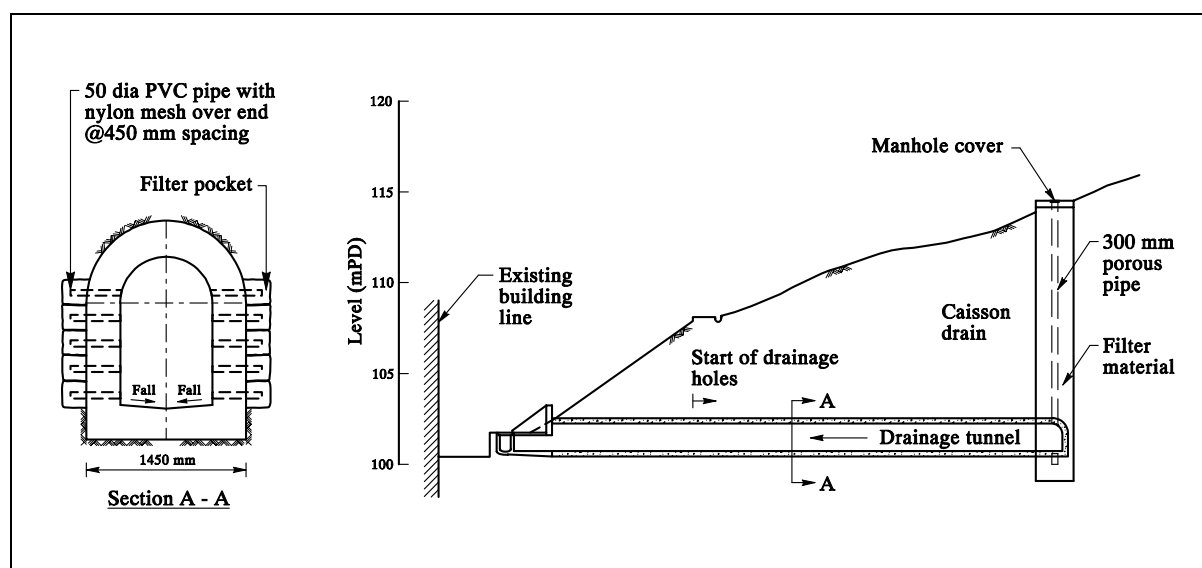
Use of Caisson Drains and Drainage Tunnel in Lowering Groundwater Table
